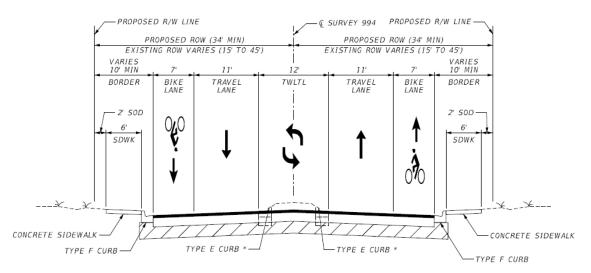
Two-Lane Road with TWLTL and On-Street Bicycle Lane
